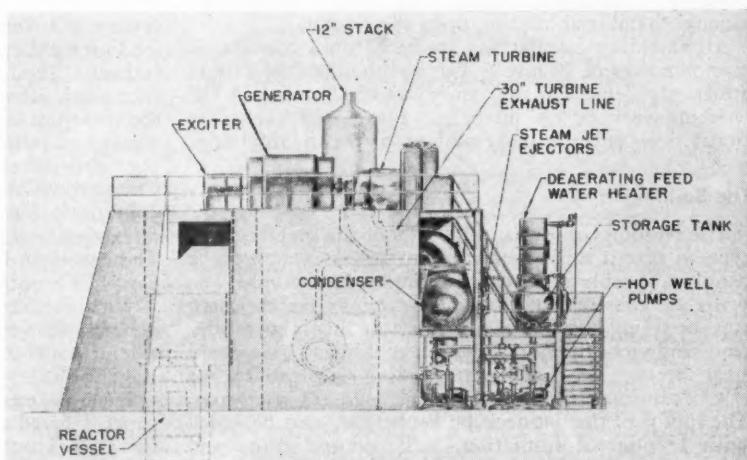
Steam and auxiliary equipment of package reactor, side elevation
